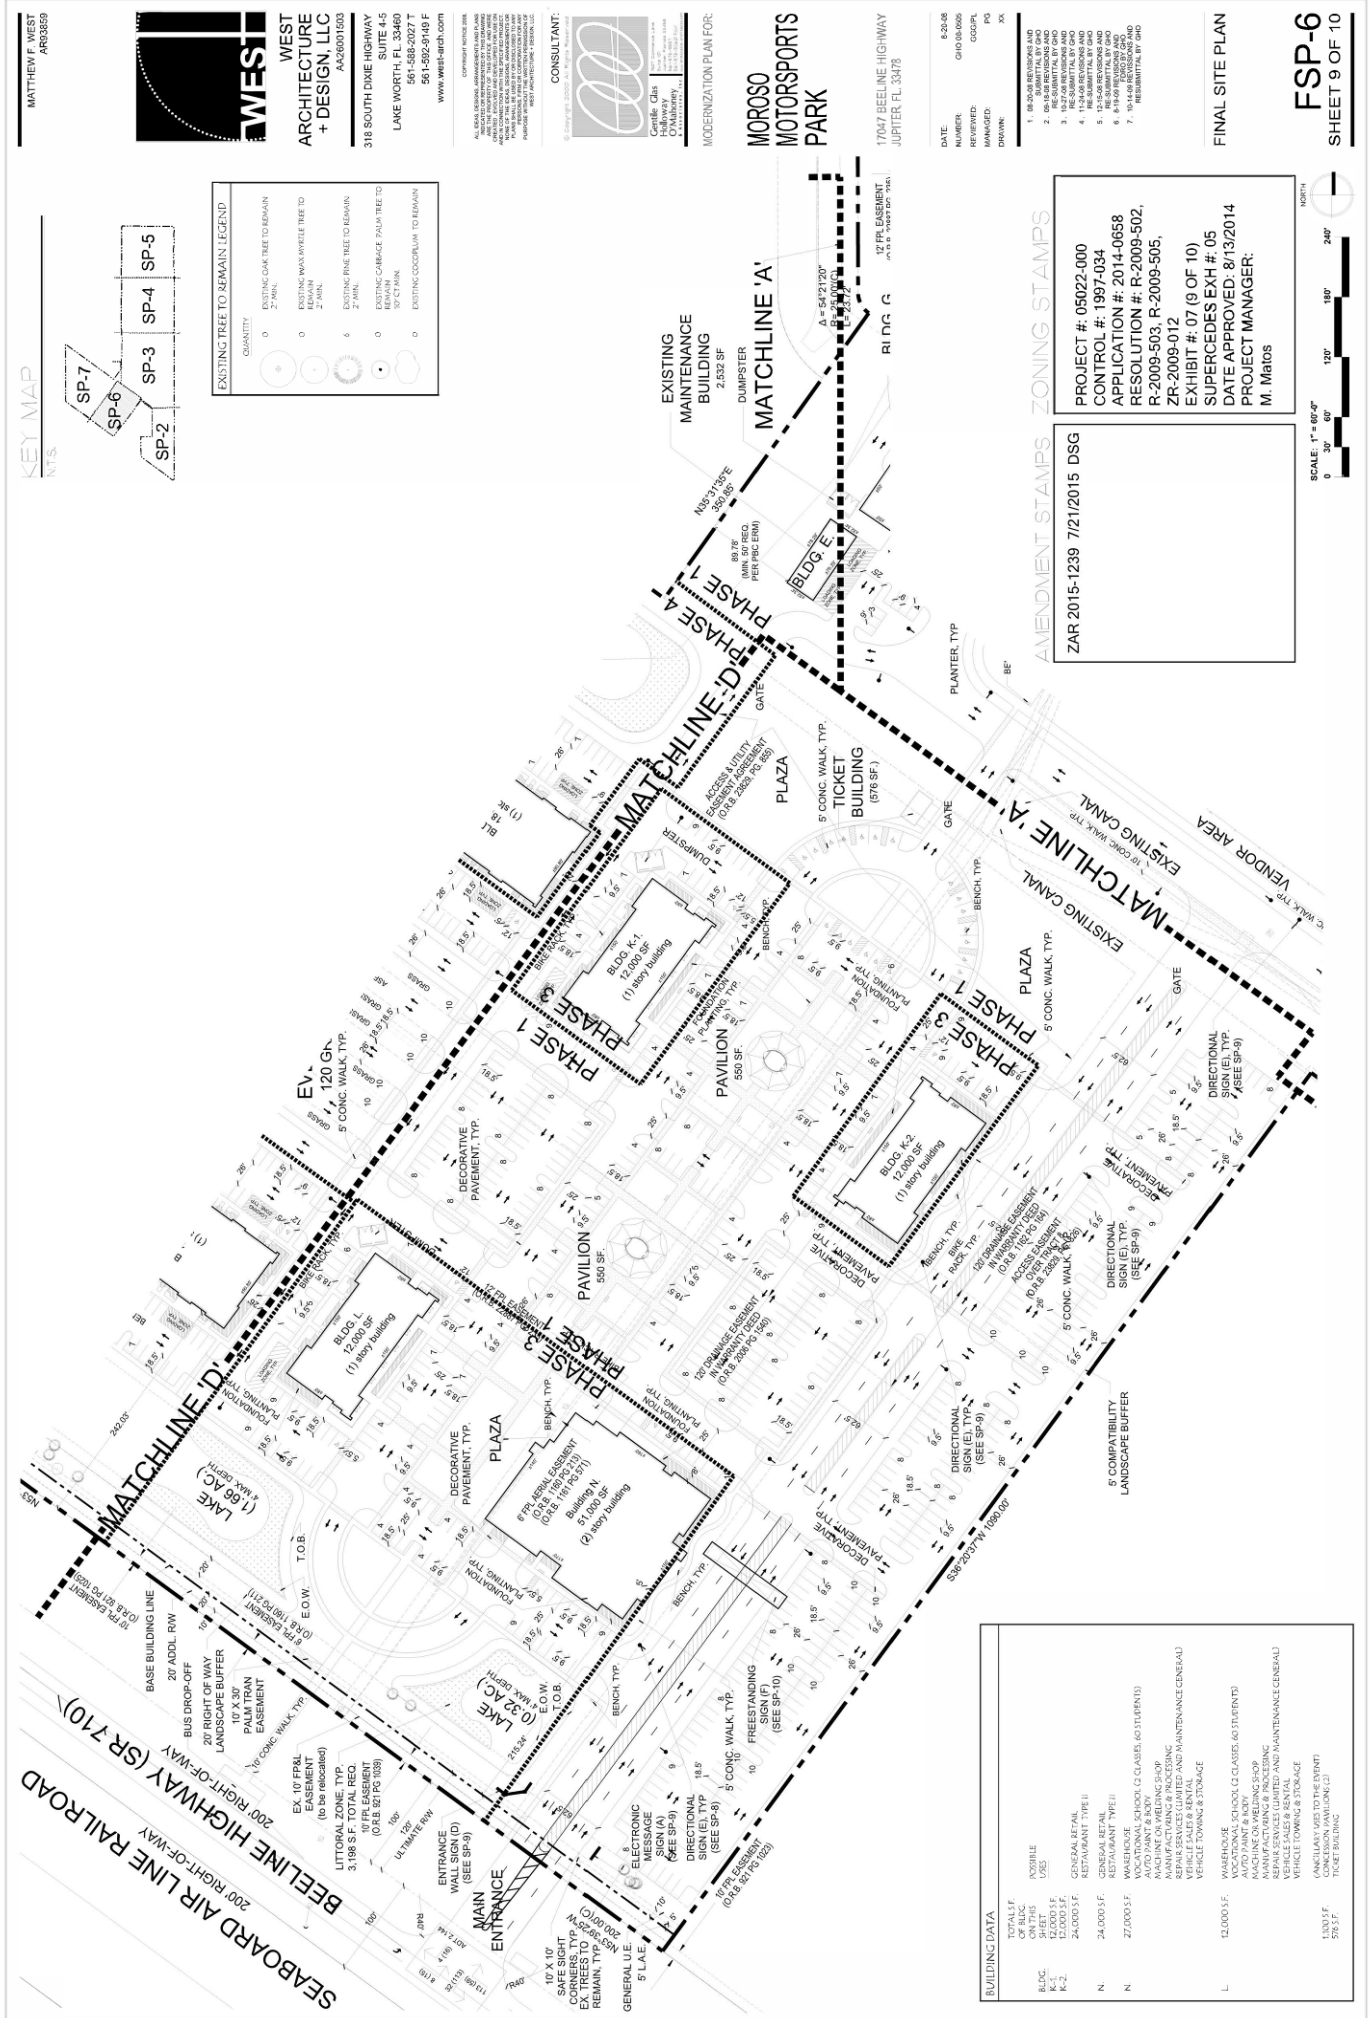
Previously Approved Final Site Plan (FSP-10 of 10) dated July 21, 2015
